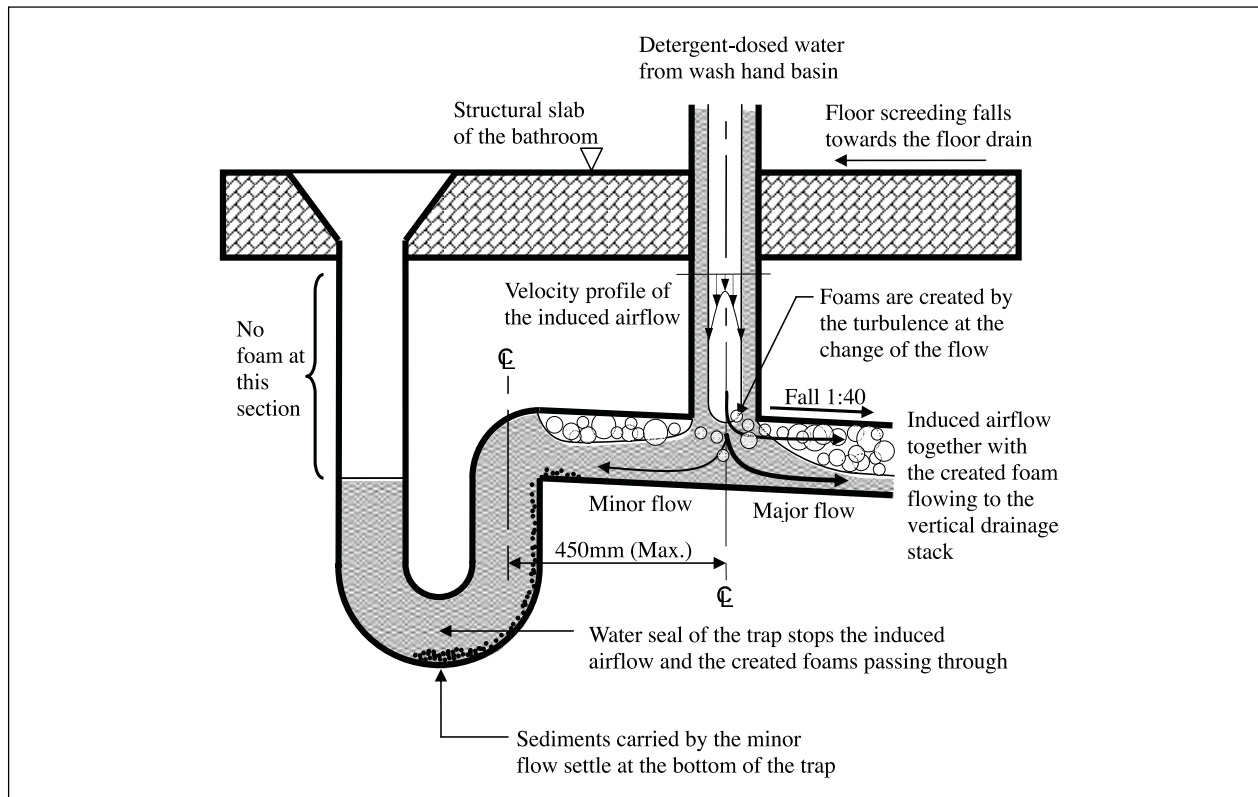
The detailed configuration of the proposed drainage connection. Wastewater that is discharged from the wash basin is discharged into the inclined tail pipe. While the downstream flow is discharged into the vertical drainage stack, the minor upstream flow replenishes the water trap. In addition, foam is unable to penetrate the water seal of the water trap and foam flooding is prevented.
